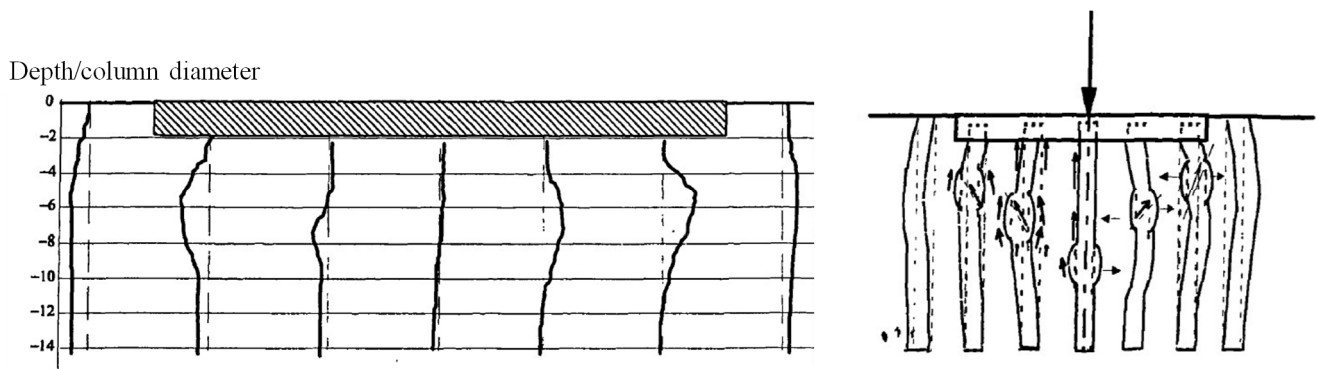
Stone columns deformation under rigid footing at failure, after (Hu, 1995)
